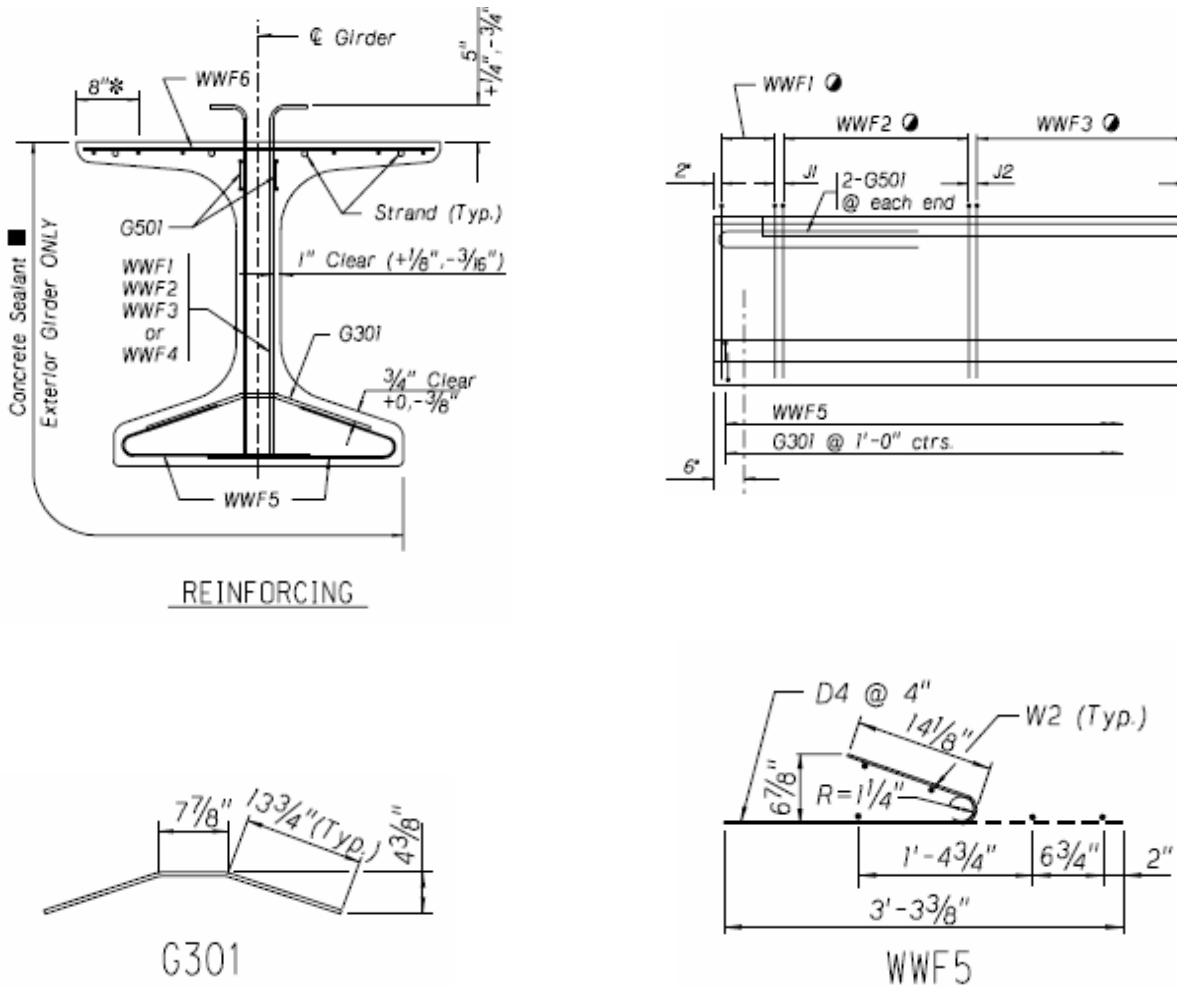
Standard Bottom Flange Reinforcement Detail in NU I-Girders (BOPP 2008)
